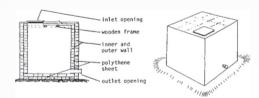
Pusa Bin Cross sectional view Capacity 0.5-4.0 tonnes LXBXH : 610-1720X610-1520X1360-1600 (mm)
